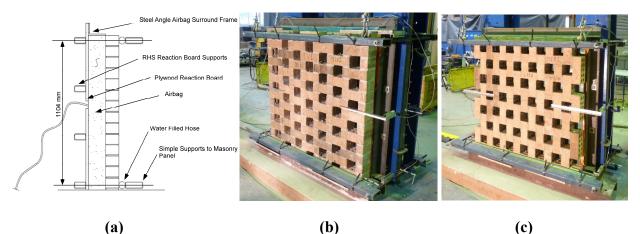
Test Setup: (a) Schematic elevation, (b) vertical bending, (c) horizontal bending
